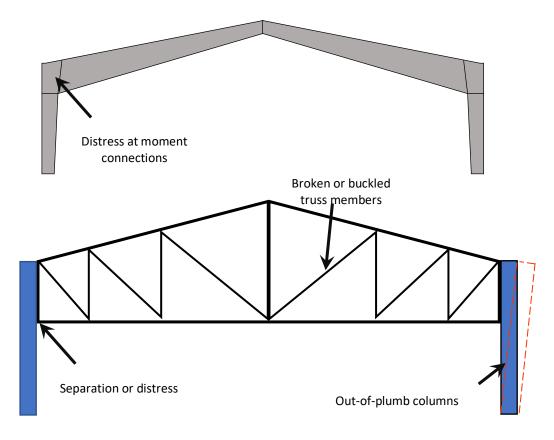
Inspection points on light-braced steel framed structures
